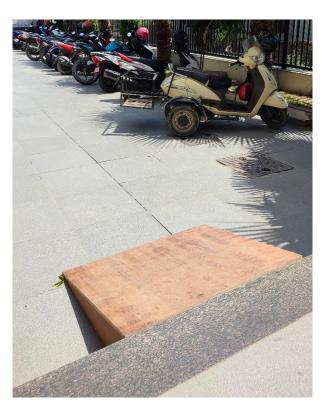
Improvised wooden ramp for workshop venue accessibility.
